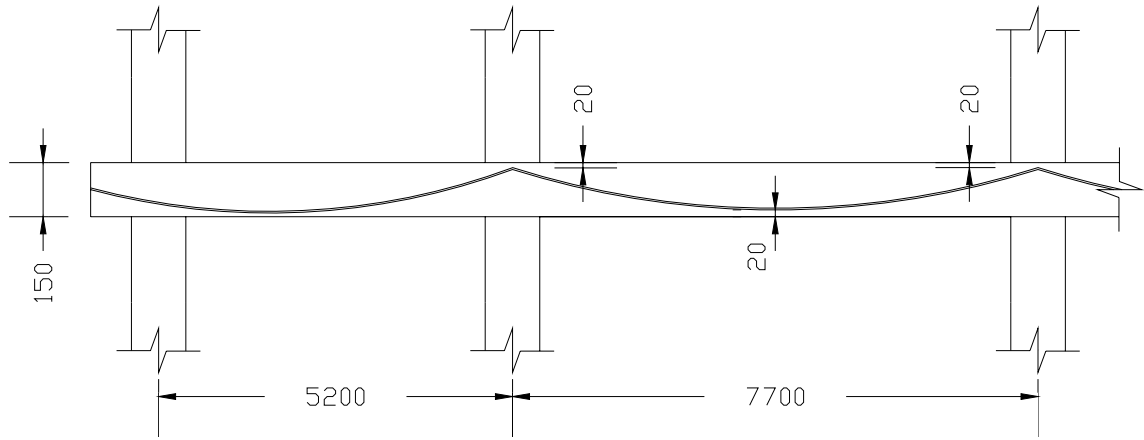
Example Slab Partial Elevation End Span and Interior Span
